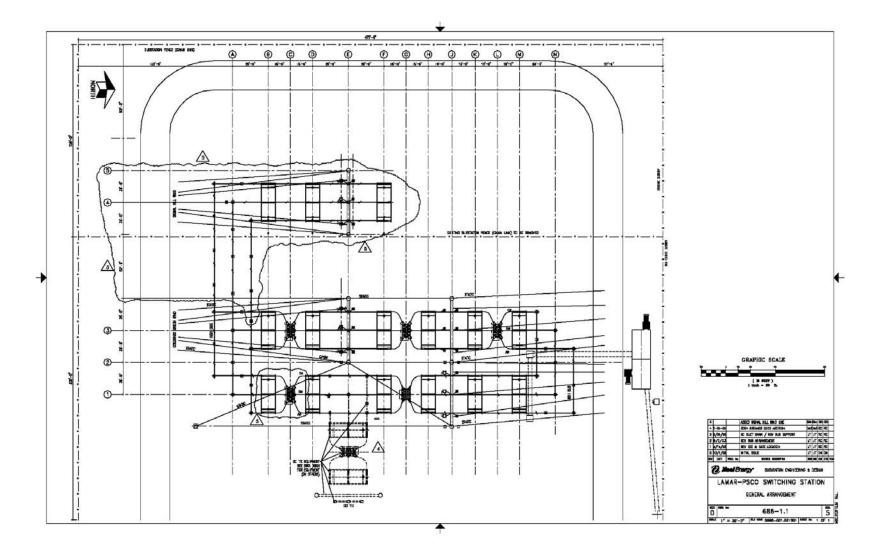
Lamar Switching Station: Proposed General Arrangement Drawing as a Stand Alone Project
